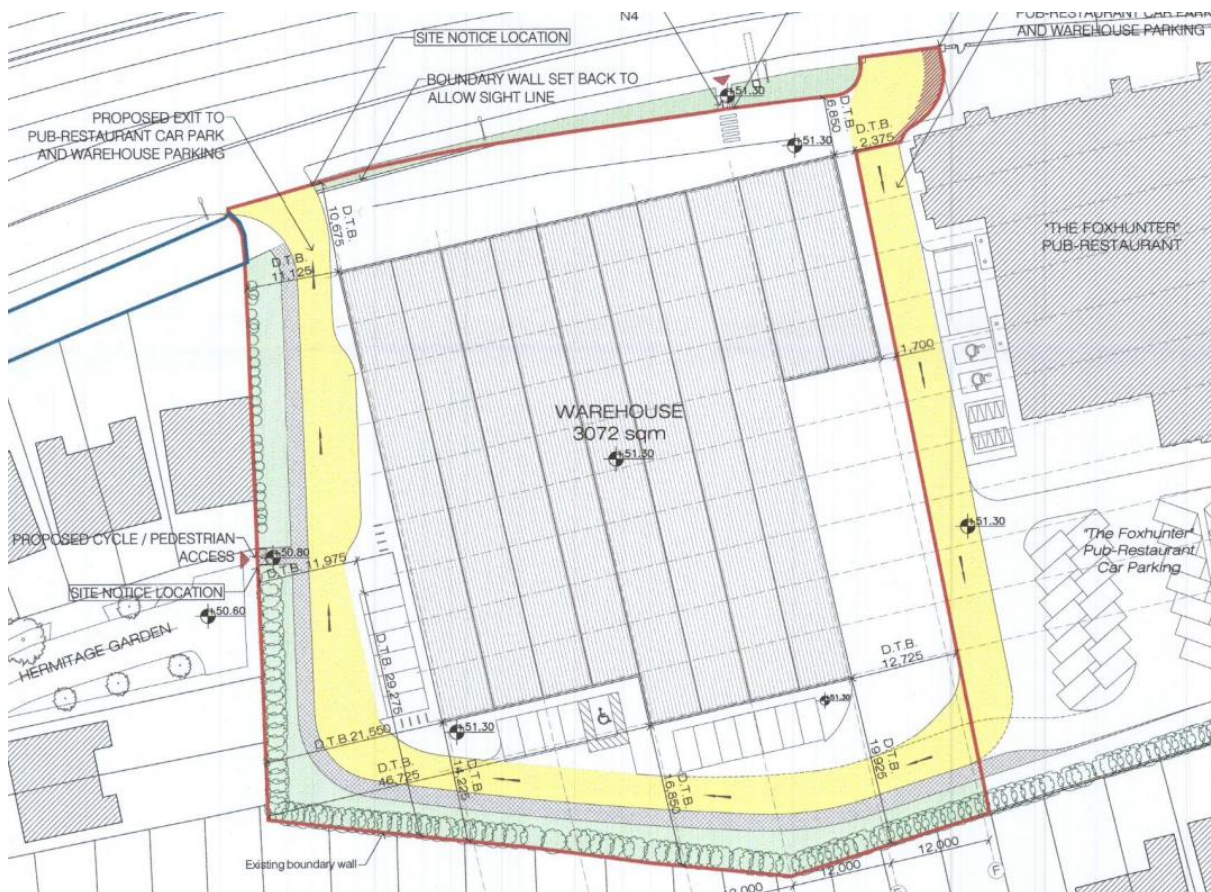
Extract of proposed site plan showing a significantly proportioned warehousing unit within close proximity to a number of dwellings.
